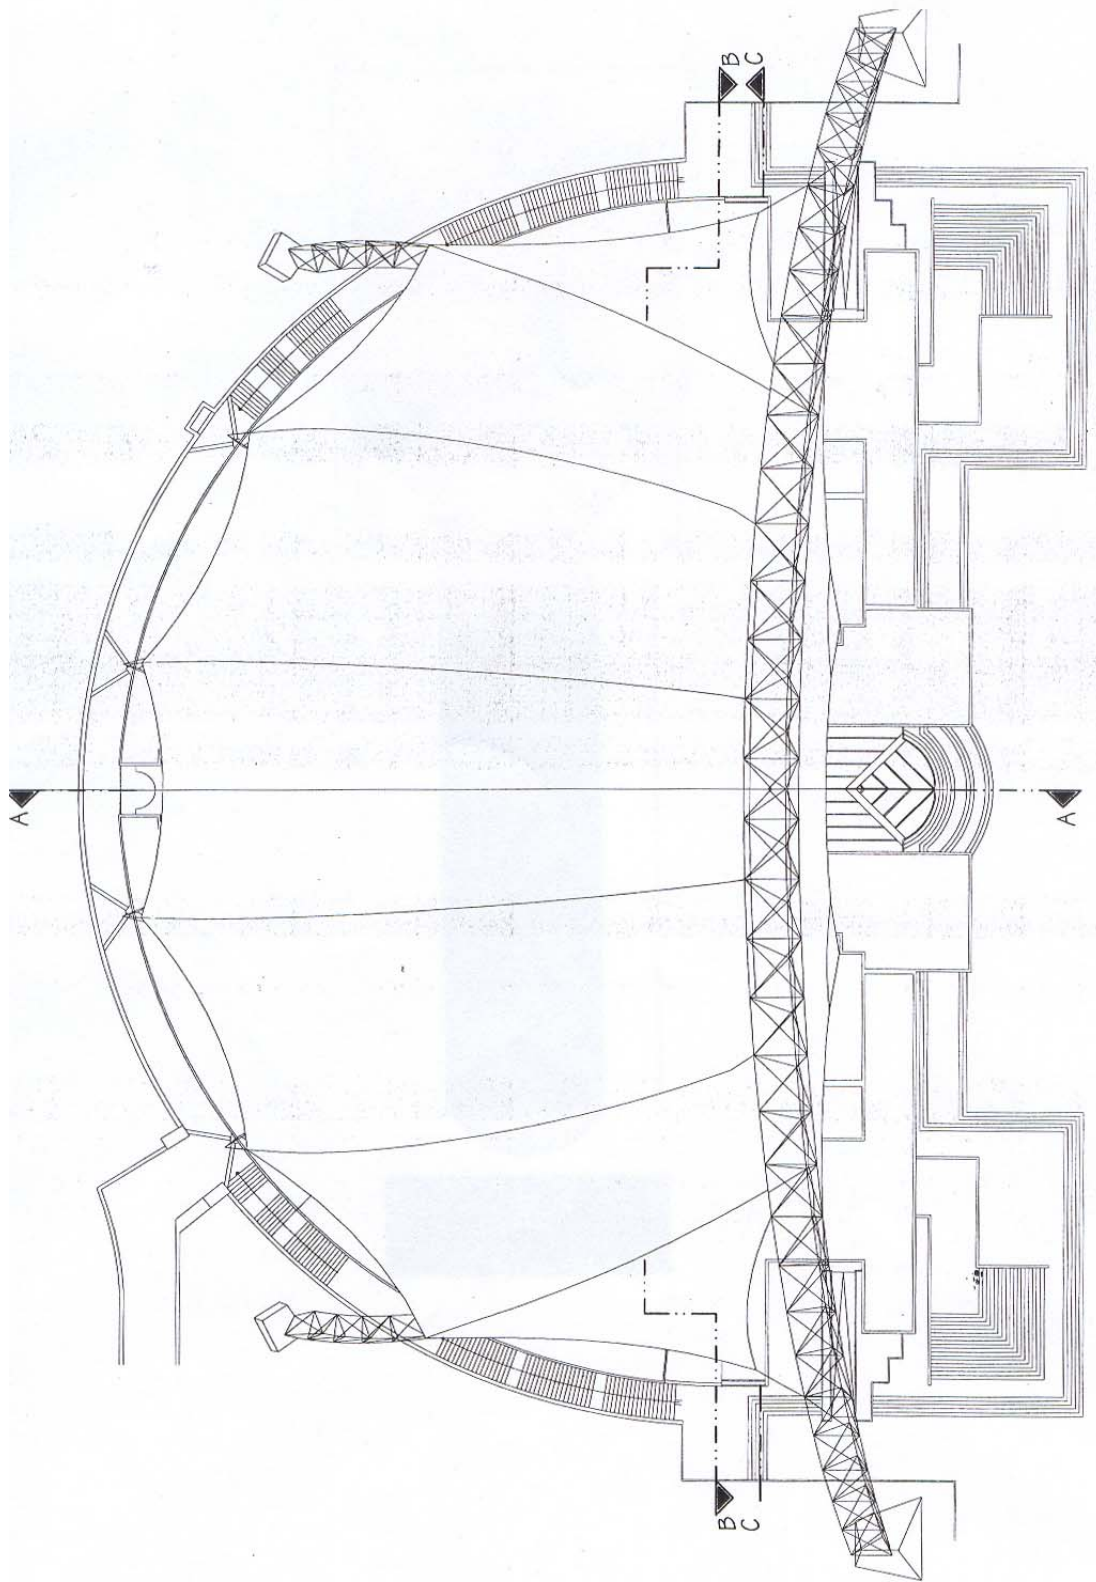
Plan view of the roof membrane of Bilkent ODEON.
